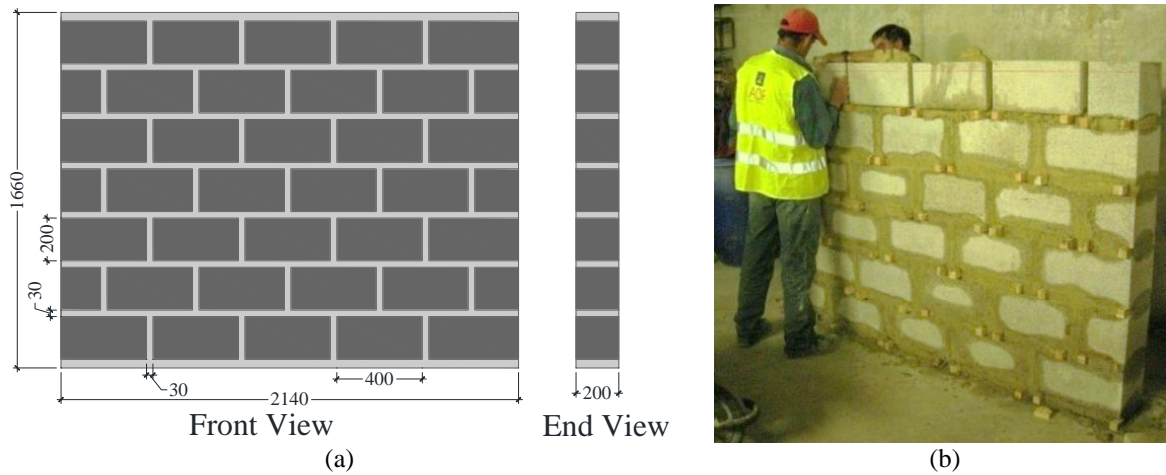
Regular granite masonry wall: (a) schematic design (dimensions in mm); and (b) construction
